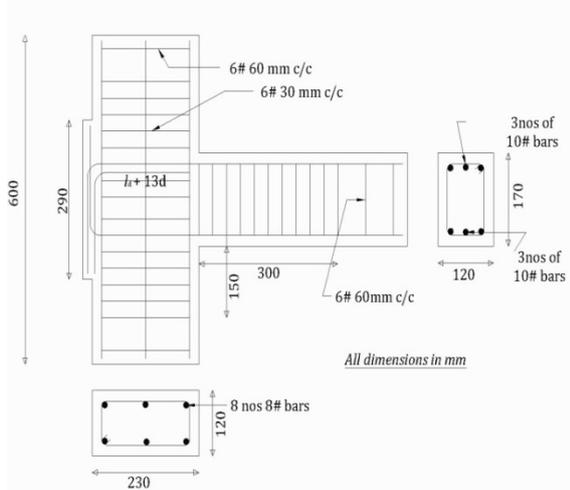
Ductile Detailing of Special Anchorage Beam Column Joint
